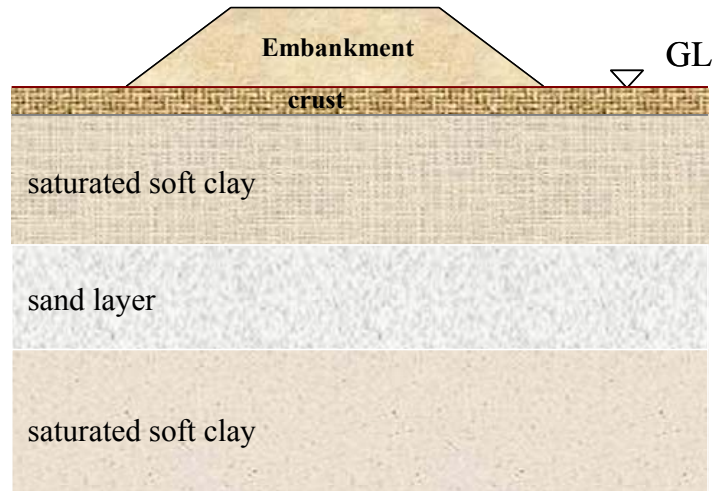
Typical Configuration of Soil Layers under an Embankment.
